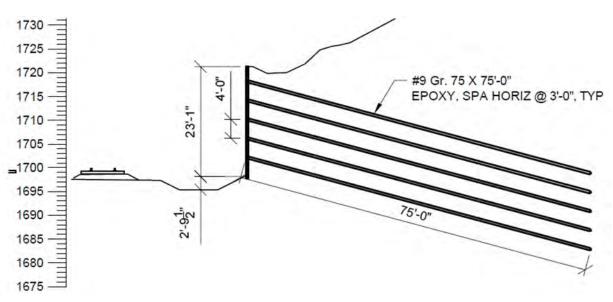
42.5 Foot Offset, Wall Location 1 Soil Nail Wall
